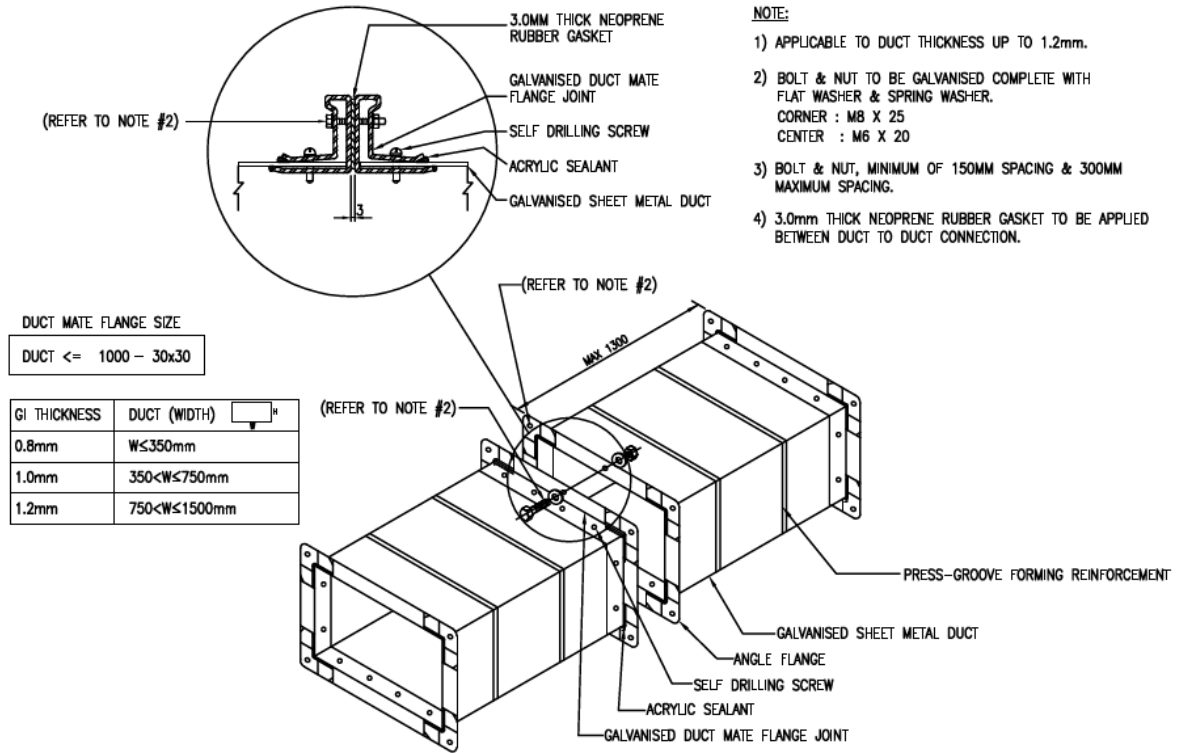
Typical duct flange details for galvanized sheet metal ductwork (Non-fire rated duct)
